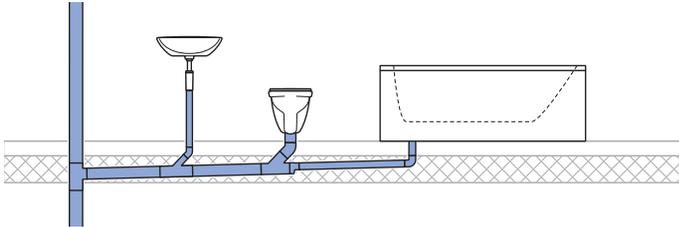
Laying the branch discharge pipe in the ceiling, single stack
